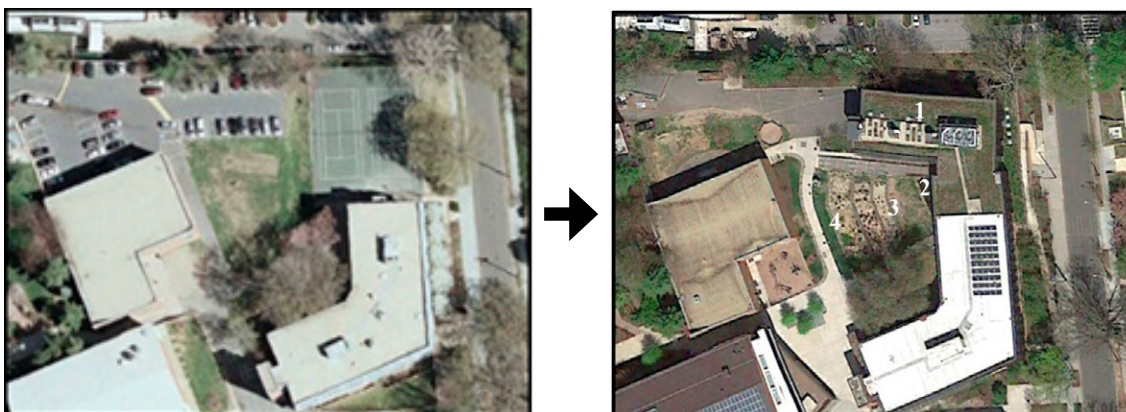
The site of the Sidwell Friends Middle School facility in Washington before and after the upgrade; 1 – green roof; 2 – retention pond; 3 – rain garden; 4 – constructed wetland
